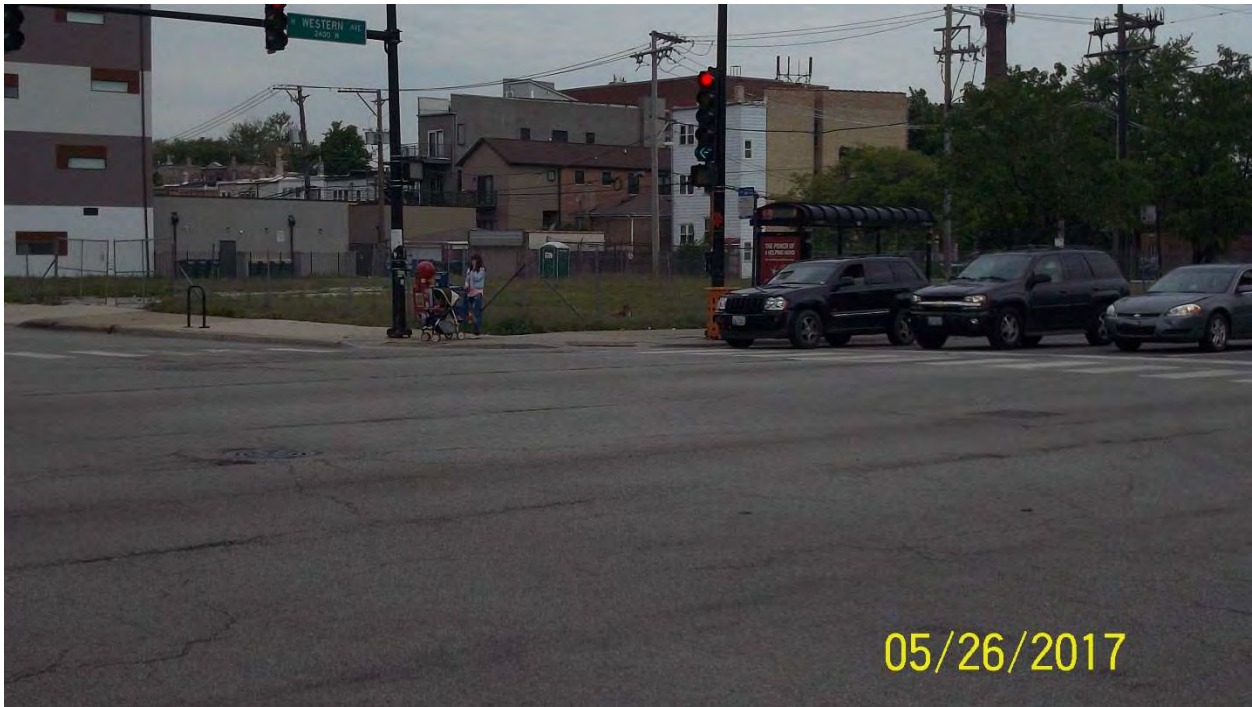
Southeast corner of Chicago Ave. / Western Ave. – Looking Northwest
